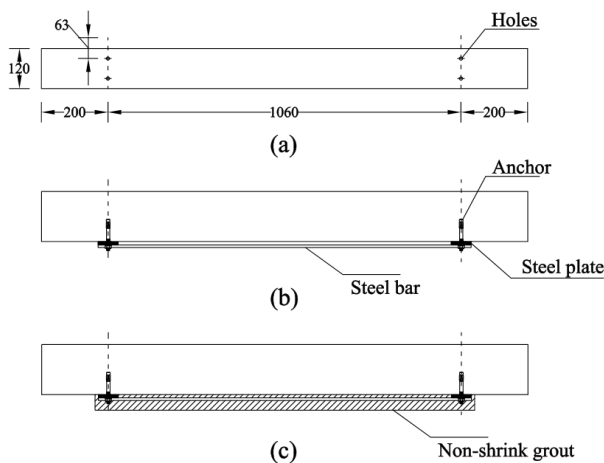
Mechanical expansion anchors with steel plate's anchorage system (mm)
